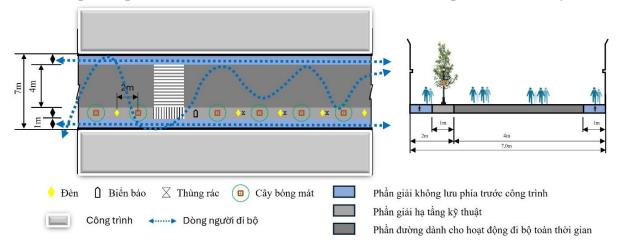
Illustration of the plan and cross-section of the full-time pedestrian street Using artistic lighting and light from the building facade to create a safe, always vibrant walking environment, increasing friendliness and safety at all times.
